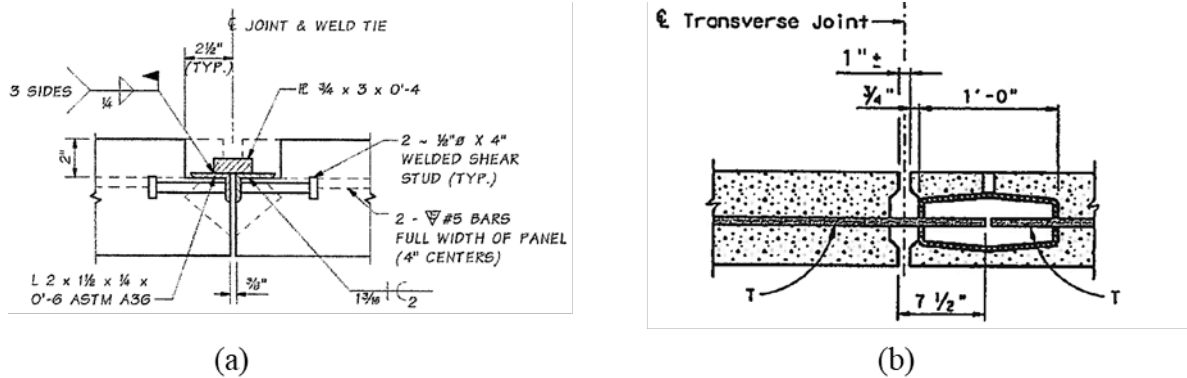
Two types of mechanical connectors: (a) welded connection detail [23] and (b) grouted HSS pocket connection [24]
